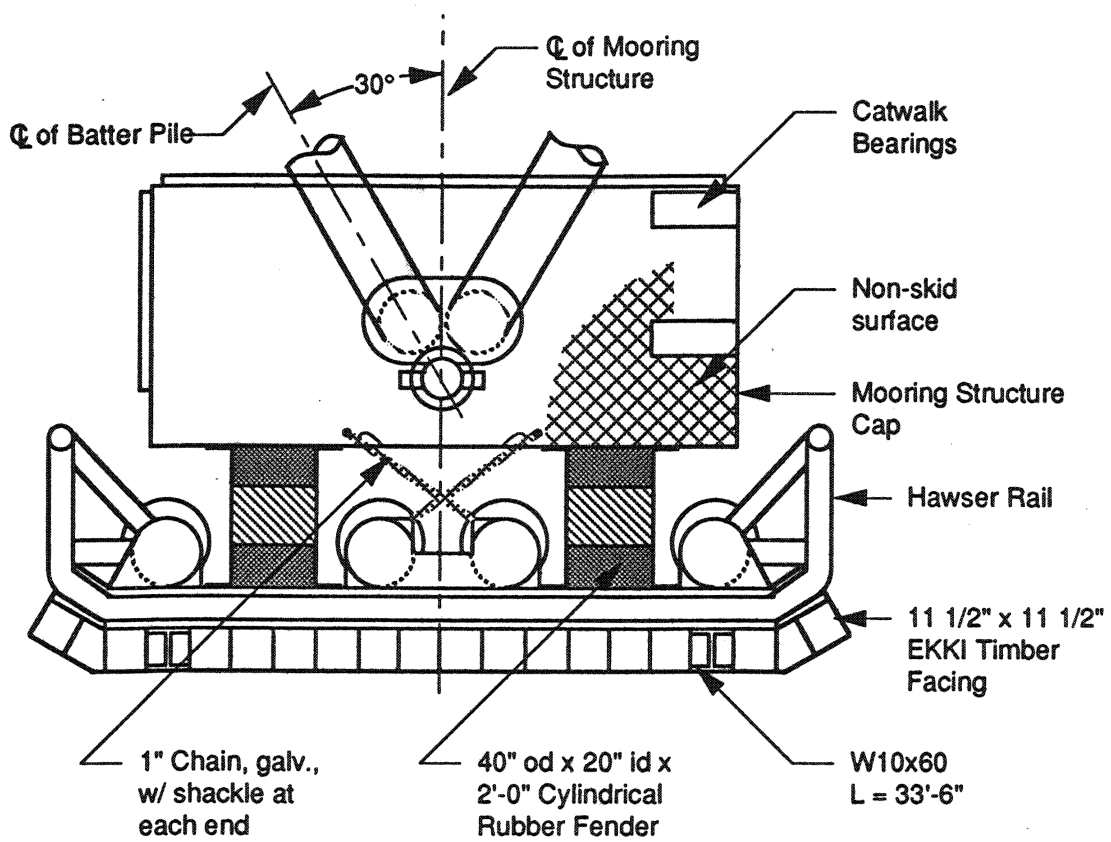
Plan of Mooring Structure – Ketchikan, Alaska
